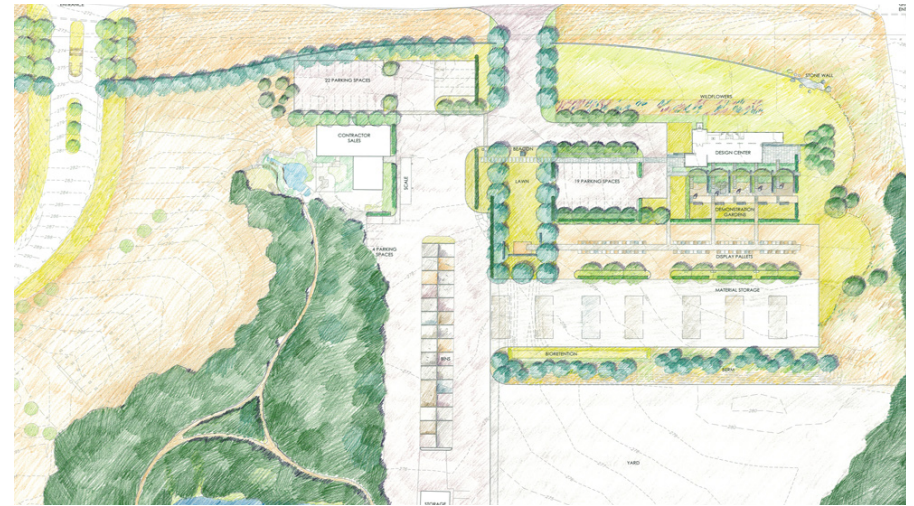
Charles Luck Stone Center site plan, Manakin-Sabot, VA.
